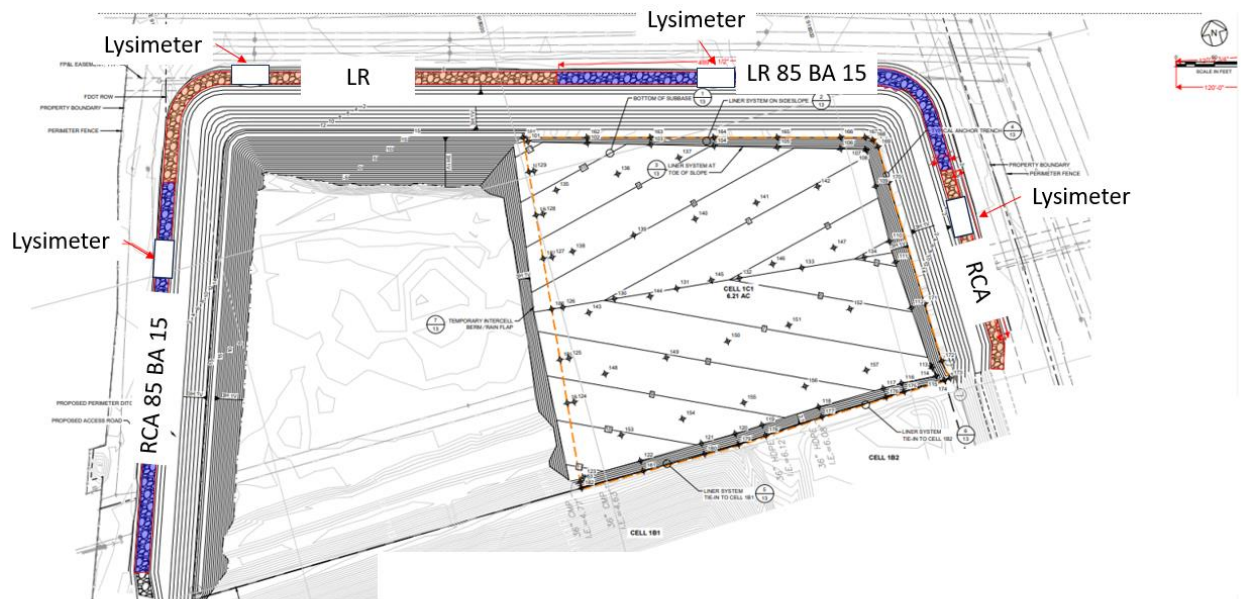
Site layout for bottom ash-derived base aggregate pilot project at the South Broward Facility including control and test base sections.
